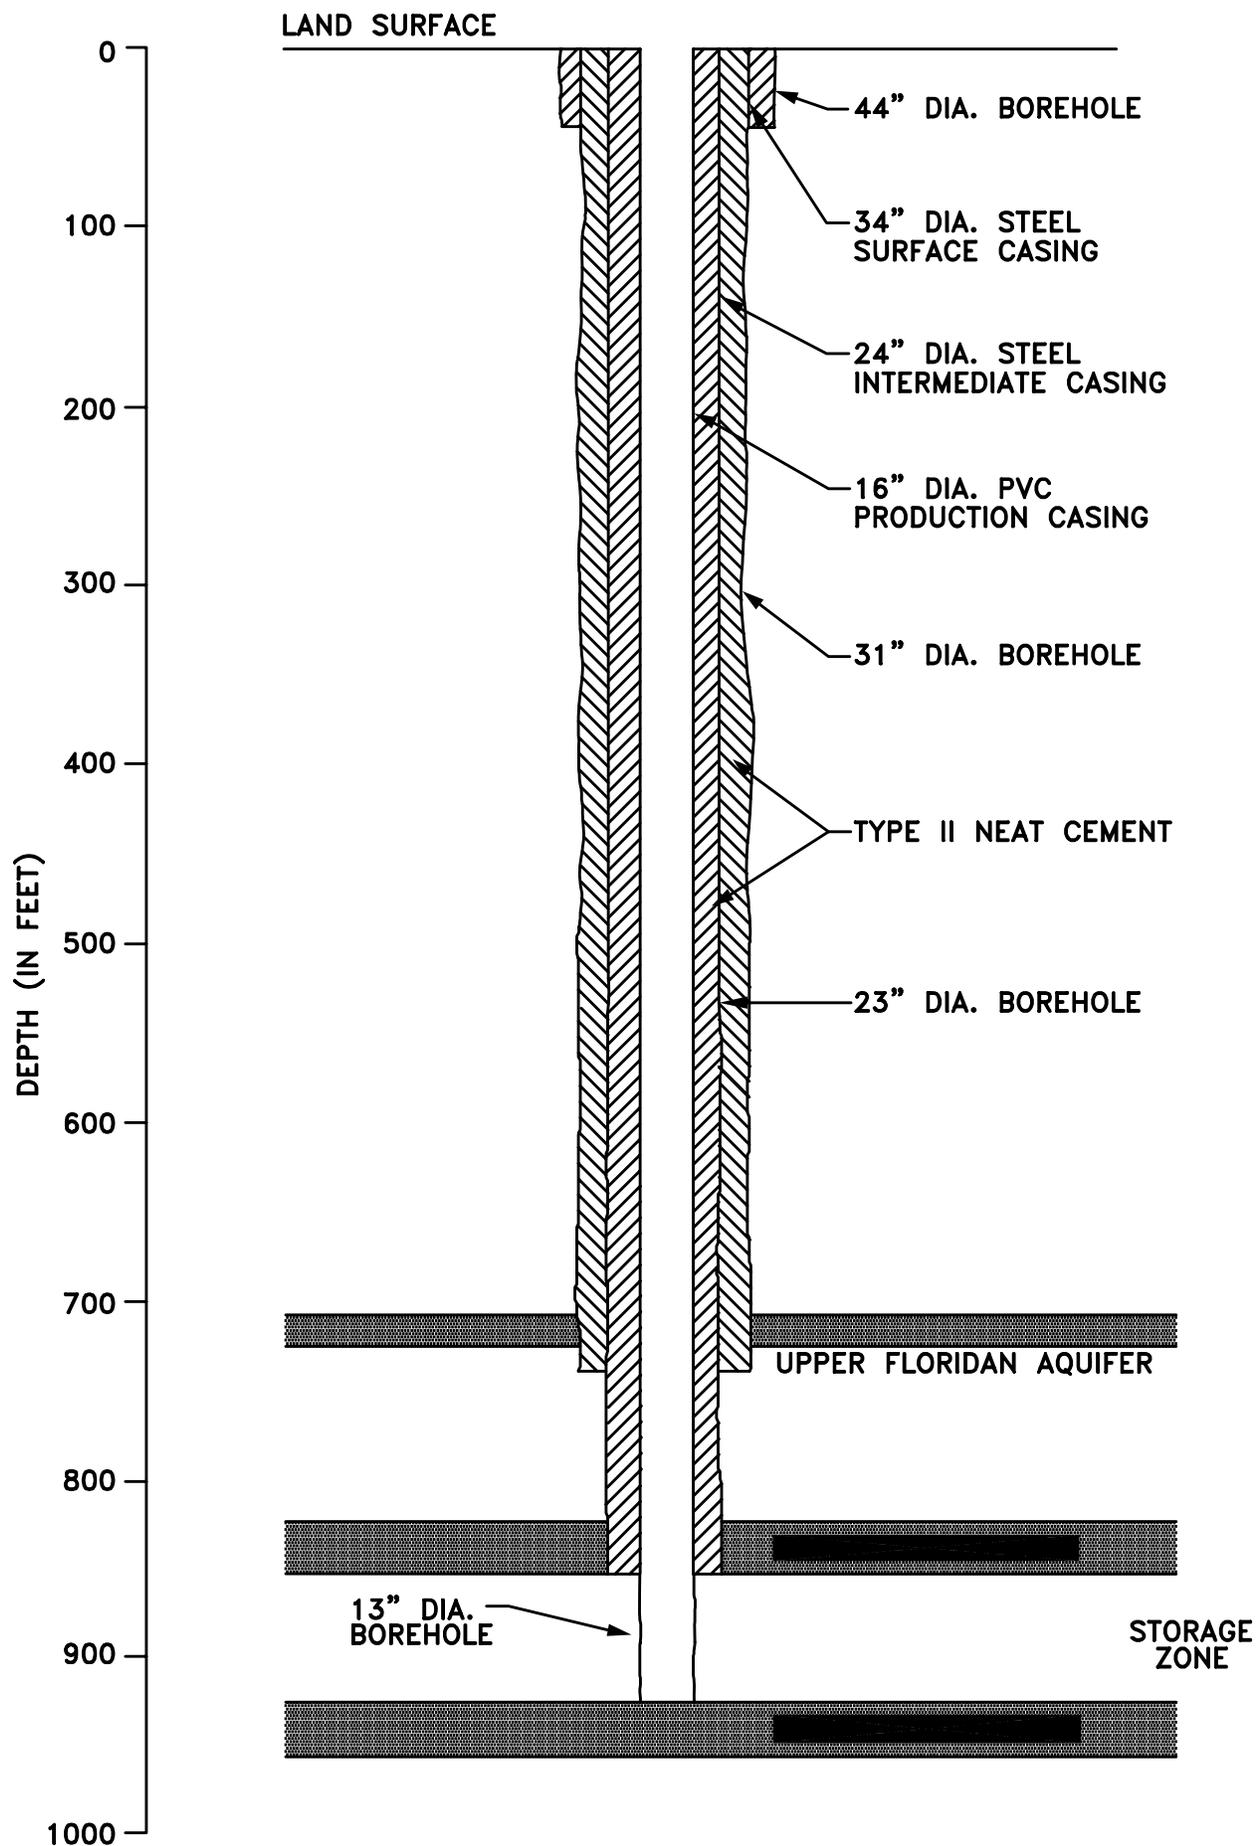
GENERAL ILLUSTRATION OF CONSTRUCTION DETAILS FOR ASR WELL.
